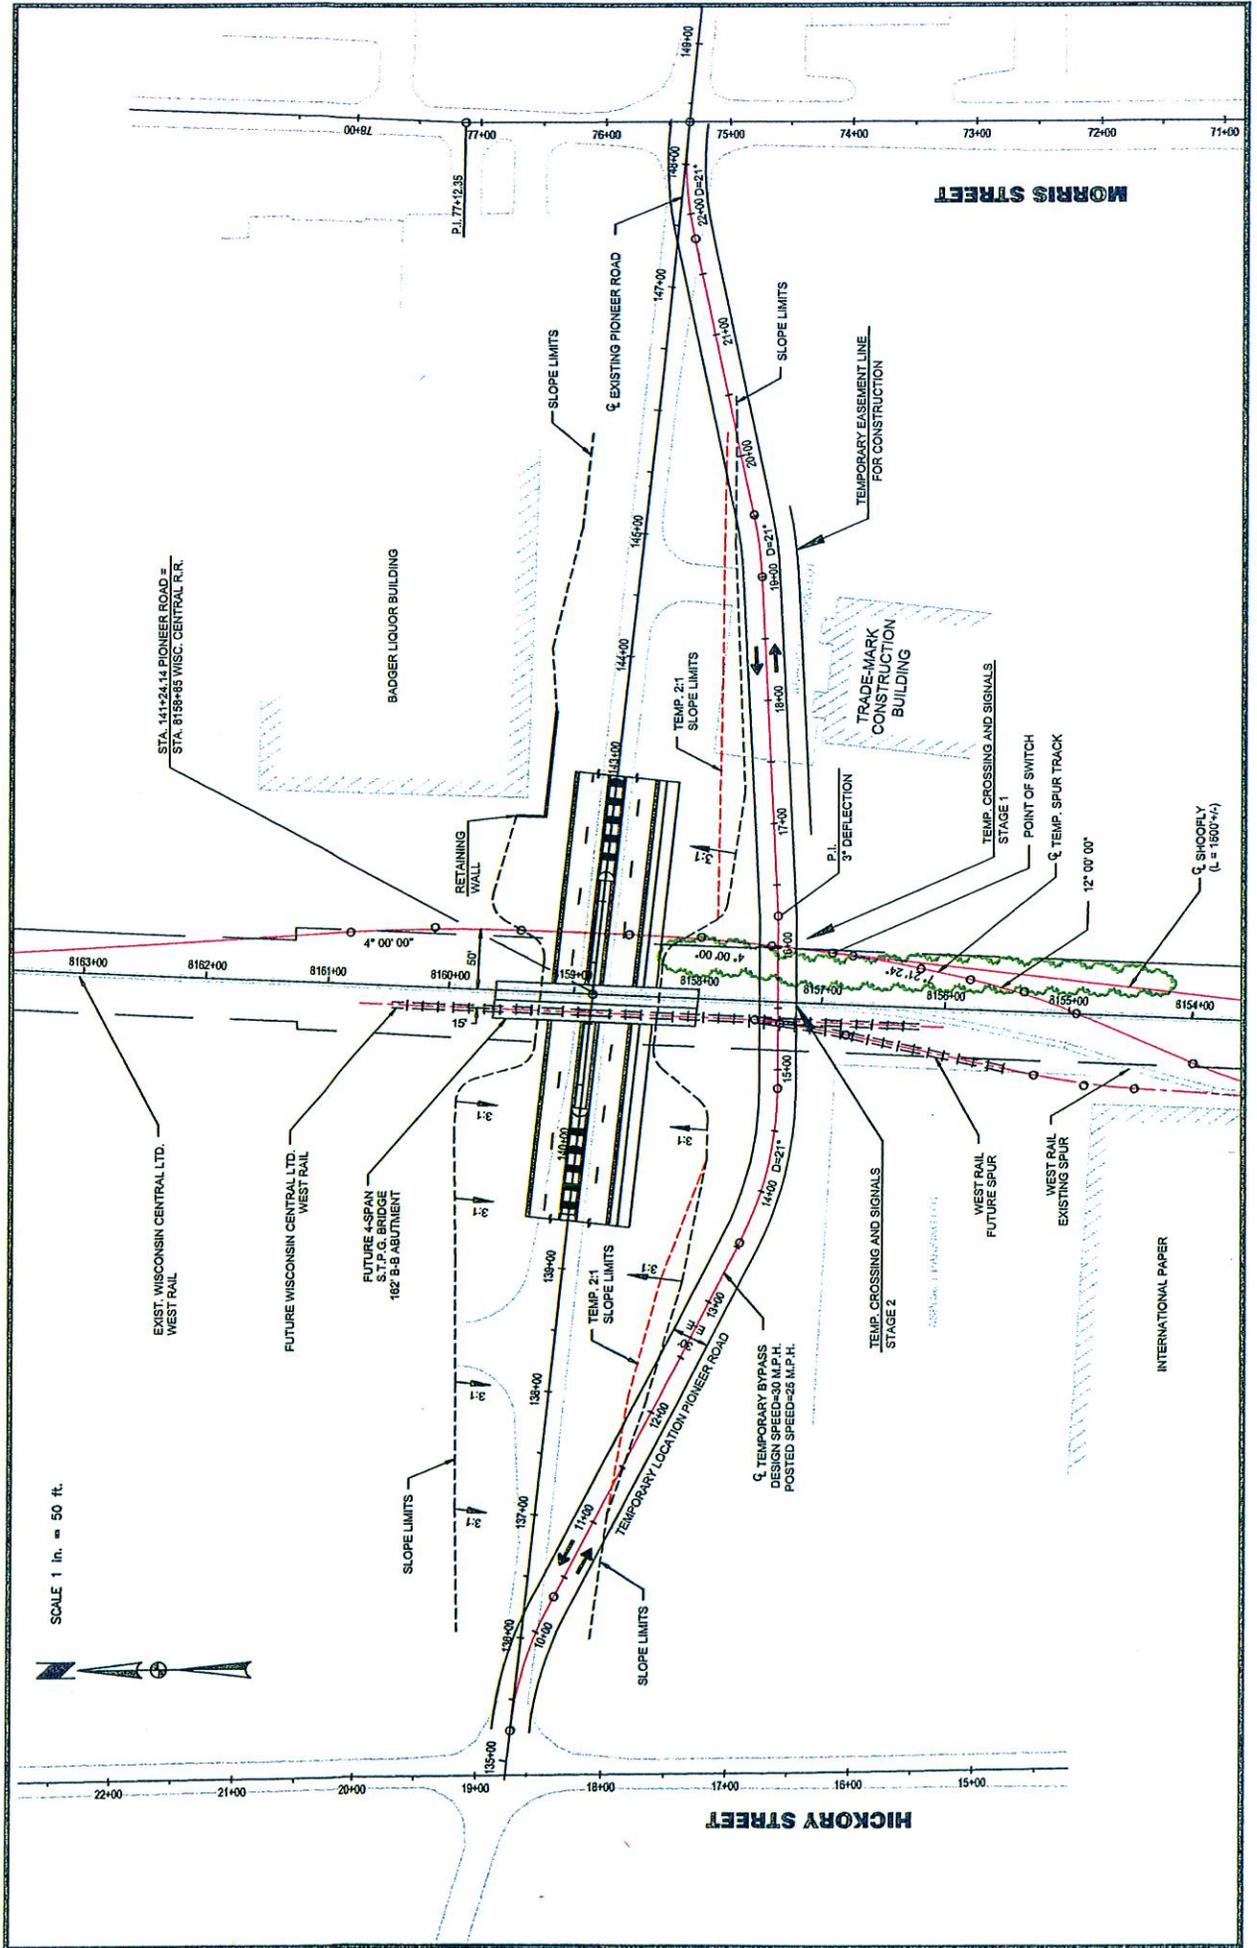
TEMPORARY SHOOFLY AND TEMPORARY BYPASS ROADWAY
